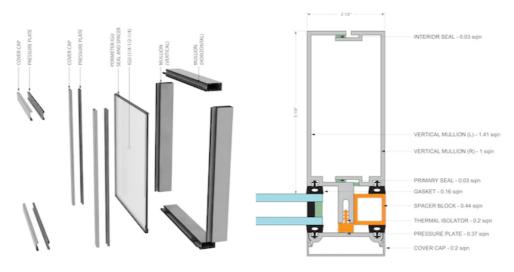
Exploded Curtainwall assembly for 1x1 meter, Figure 2a - Curtainwall assembly detail
